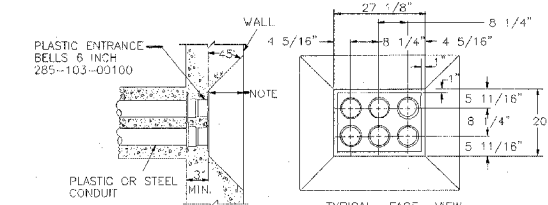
MANHOLE ENTRANCE WITH PLASTIC TERMINATORS (OLDER STYLE) FOR PLASTIC OR STEEL CONDUIT (POCKET TYPE)
